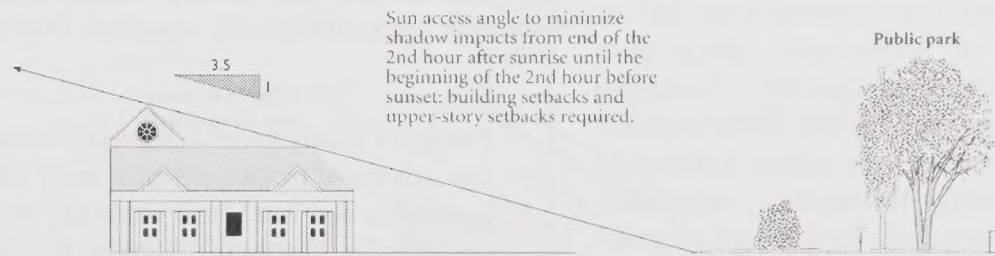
Sun Access Angle Around Public Parks — Section View
